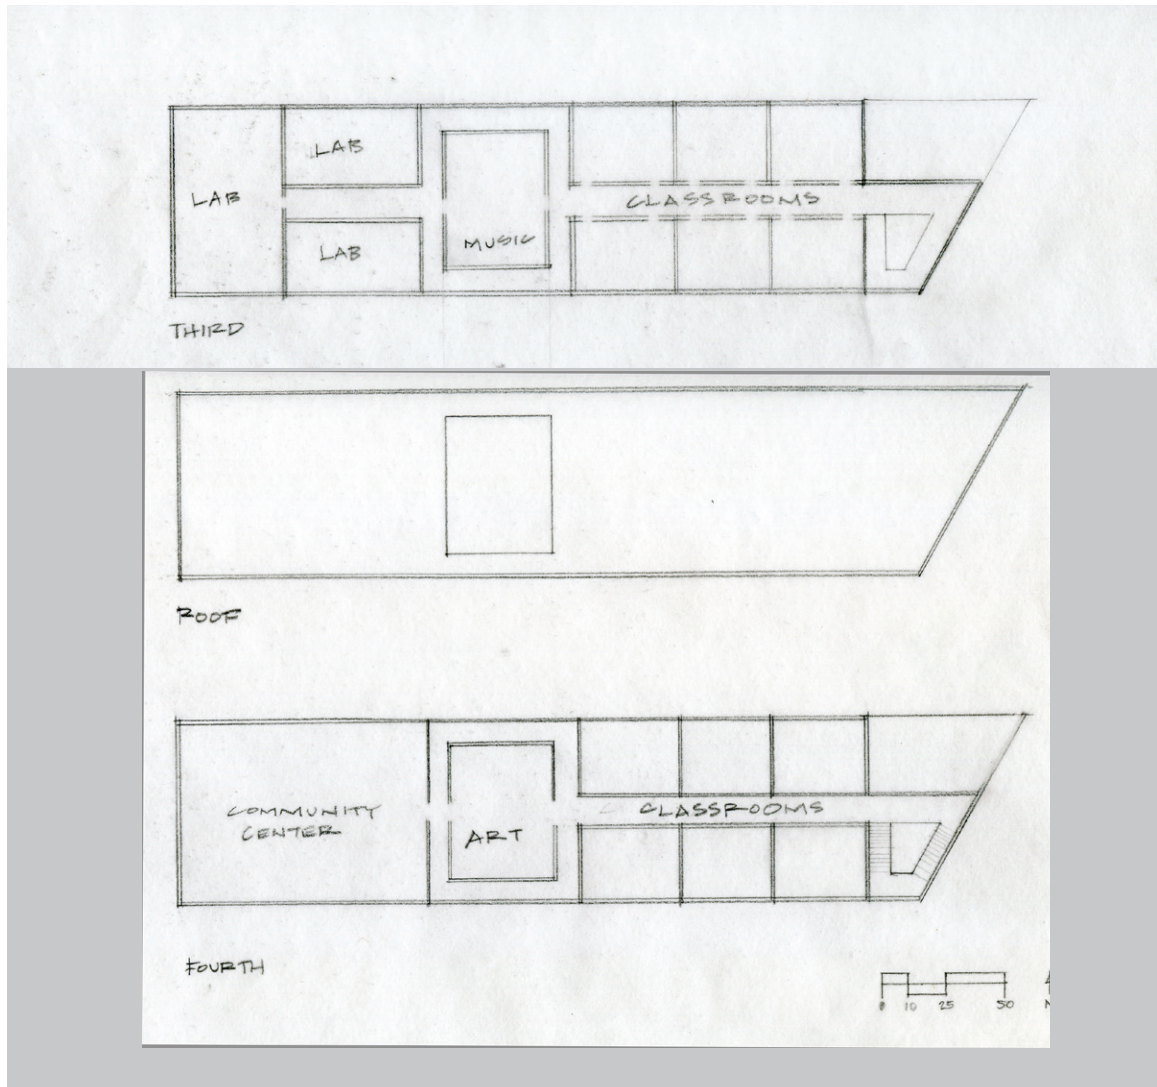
Schematic Plans - Third Floor, Fourth floor and Roof
